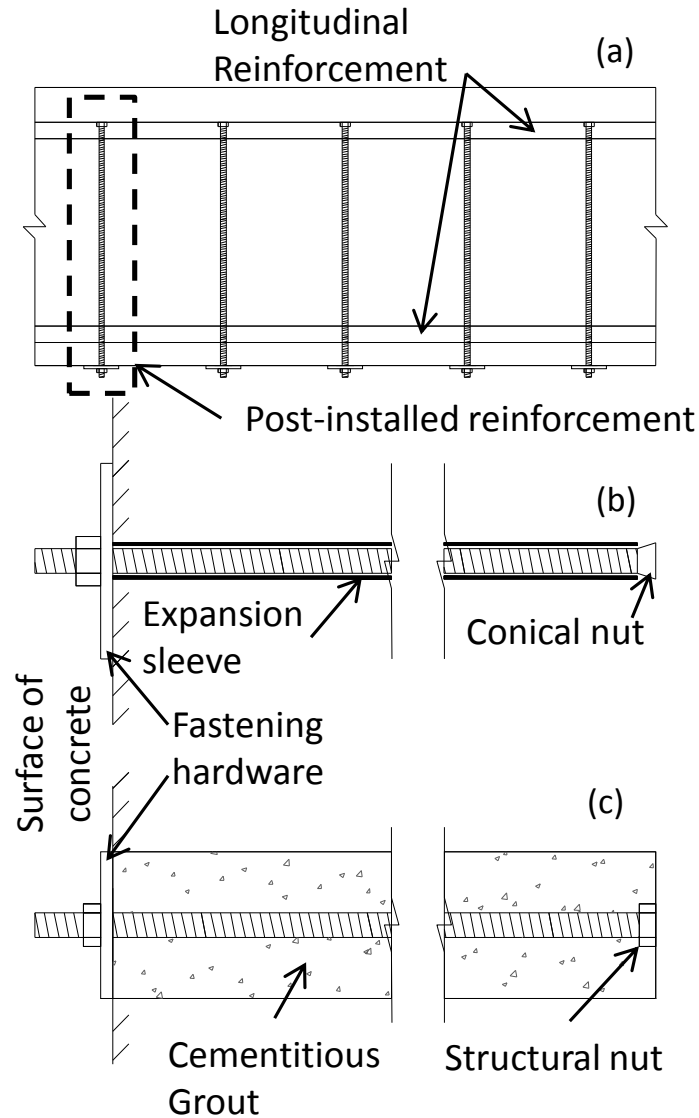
Retrofit techniques under investigation. a) schematic layout of post-installed reinforcement in a specimen without transverse reinforcement; b) undercut anchor components; c) grouted anchor components.
